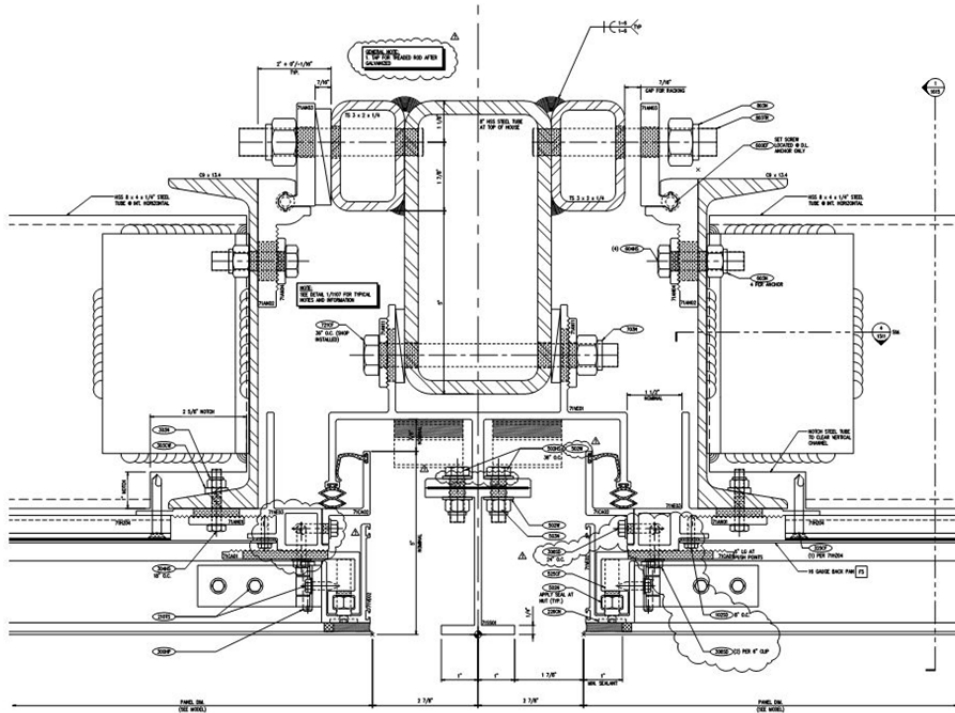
Sloped Façade Detail of Unitized System and Rafter Assembly
